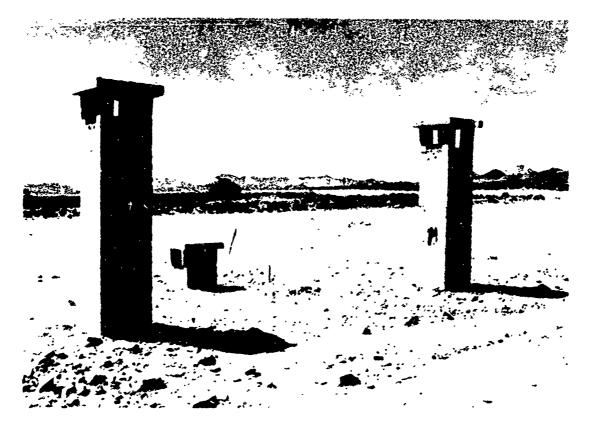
Above-ground view of intake and exhaust stacks.
